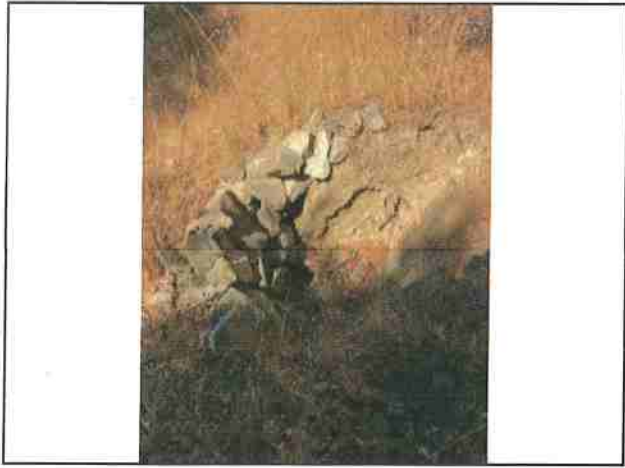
Mad River Medicinals Private Access Rd Looking @ 18" Culvert In
